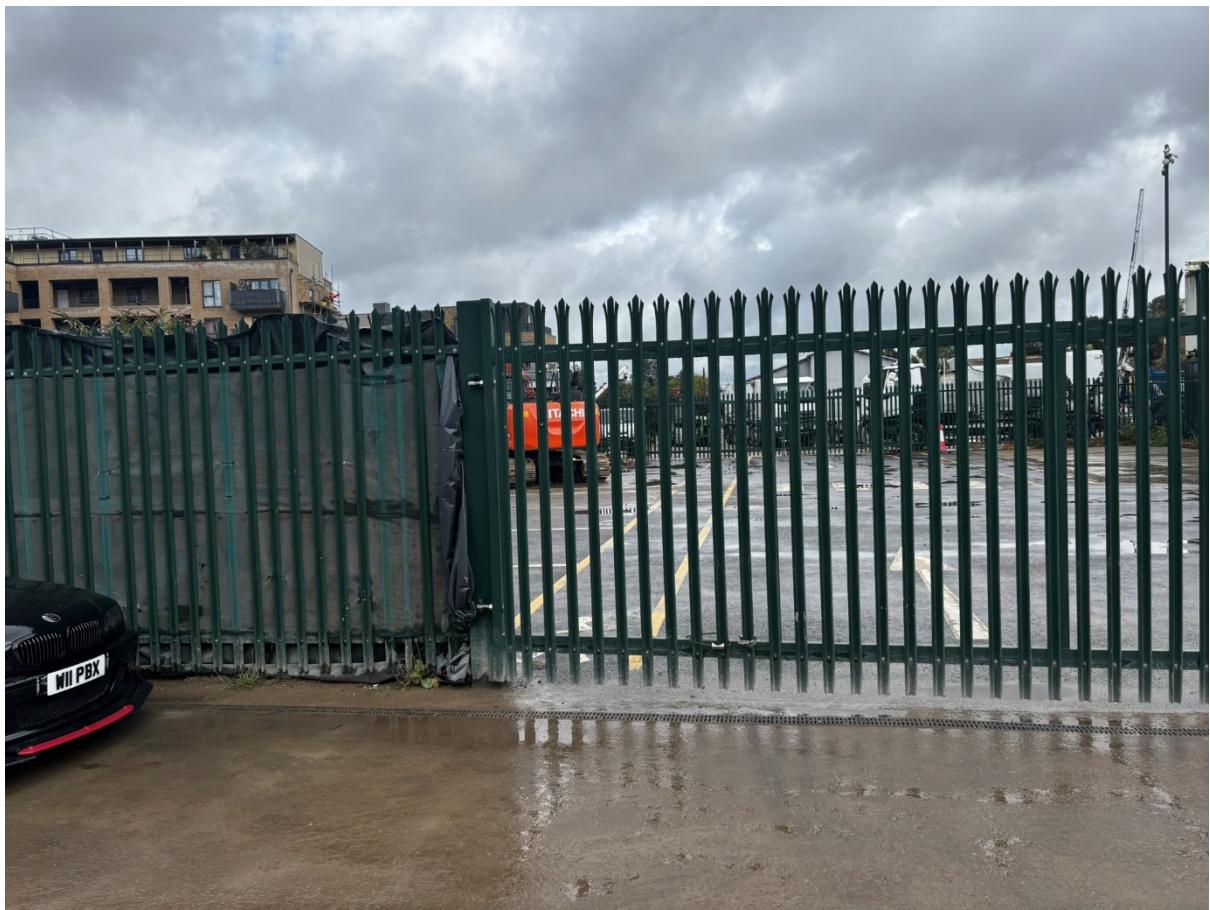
Parking area located in the central area of the site (photo taken looking east).
